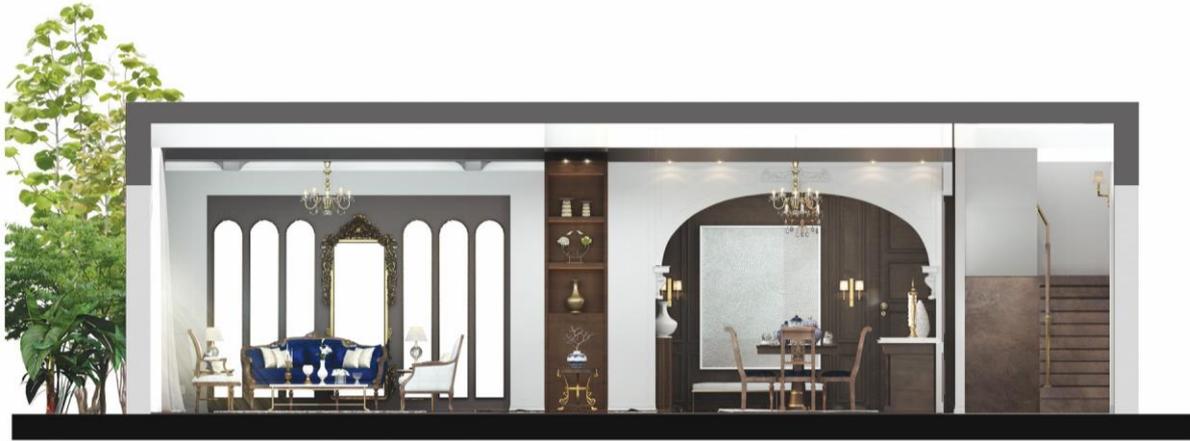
Section (B-B), Ground Floor of Twin House project. (source: Auther,2021).
